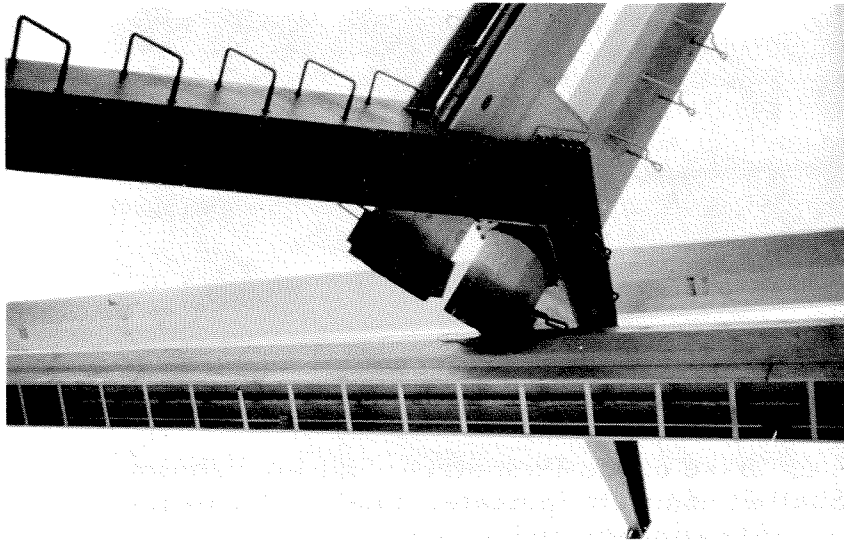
Two electrical transmission towers not yet welded at the construction joint failed during the earthquake. The completed towers were not damaged.
